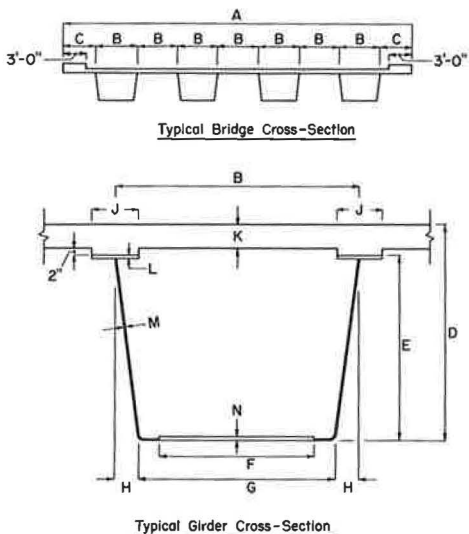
Typical midspan cross sections for bridges considered in analytical study.
